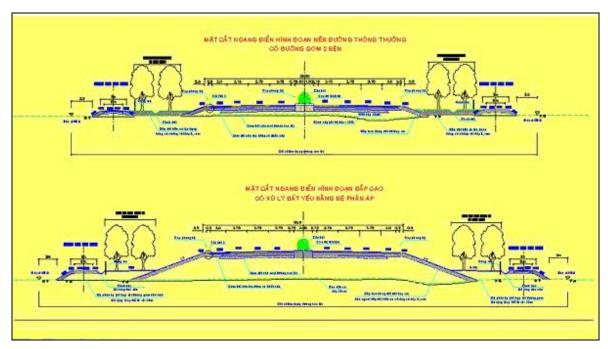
Typical cross-section of Hanoi – Hai Phong Expressway
